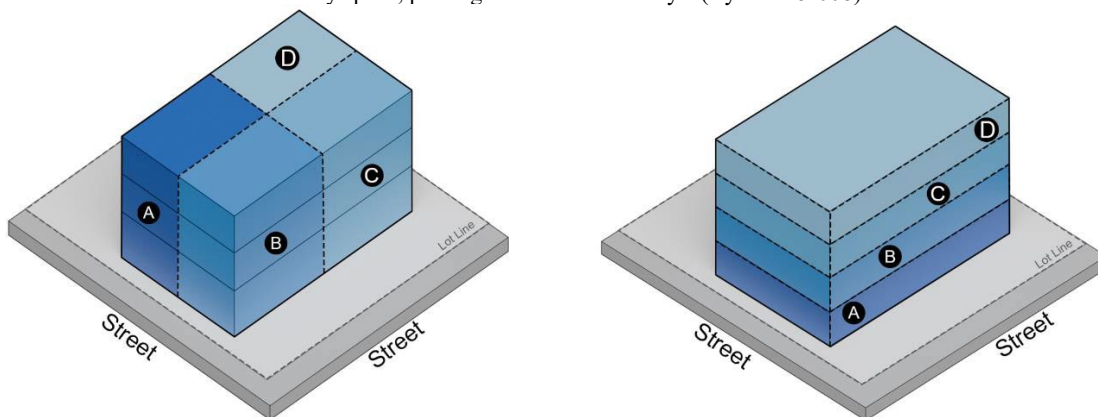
Example of unit layouts for Four Unit Dwellings (25-008)
